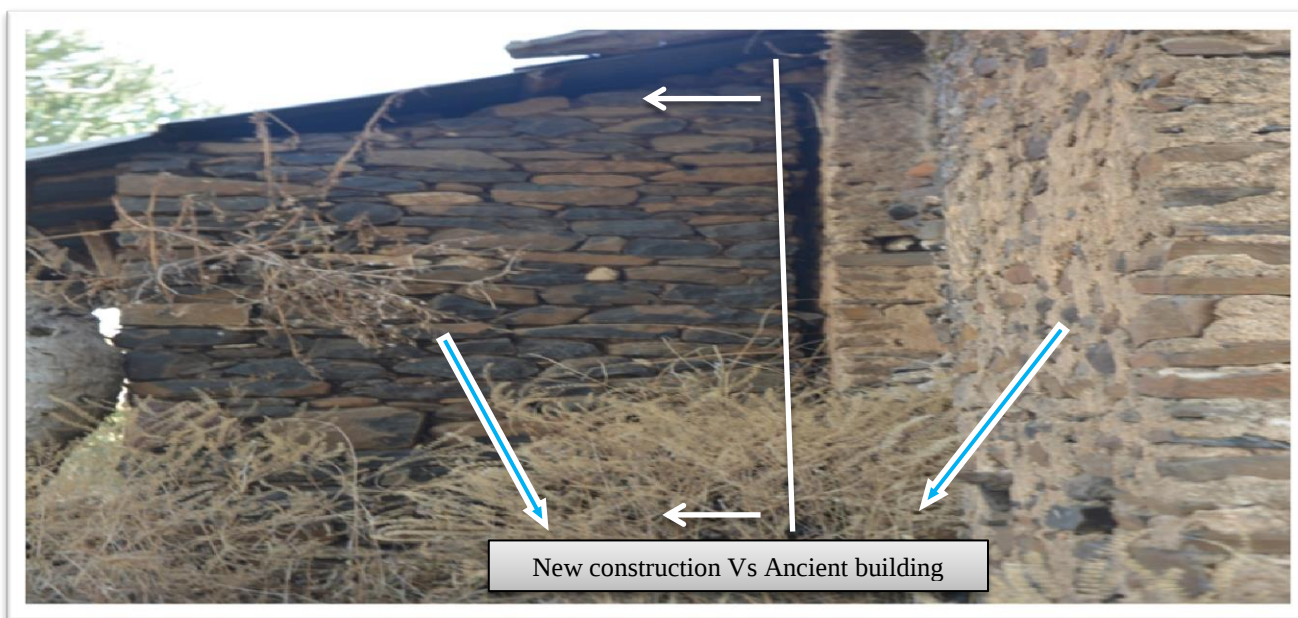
New added room to the original building, view at side (in terms of material construction, techniques of construction, compactness, authenticity etc...) (Photo by Kedir 2018)
